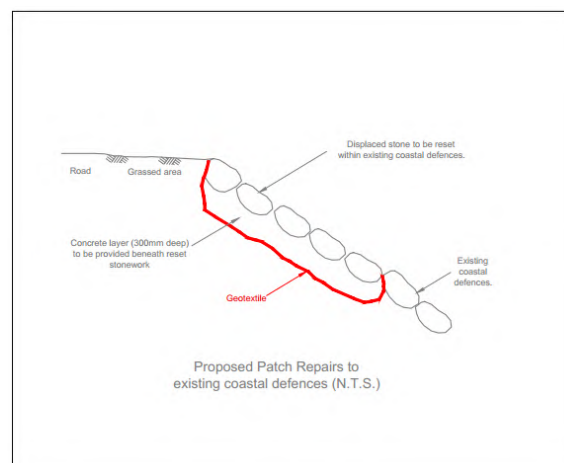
Extract of civil engineering drawings for proposed Coastal Works at Bellurgan showing section through proposed stone sea wall for Locations C Work Area
